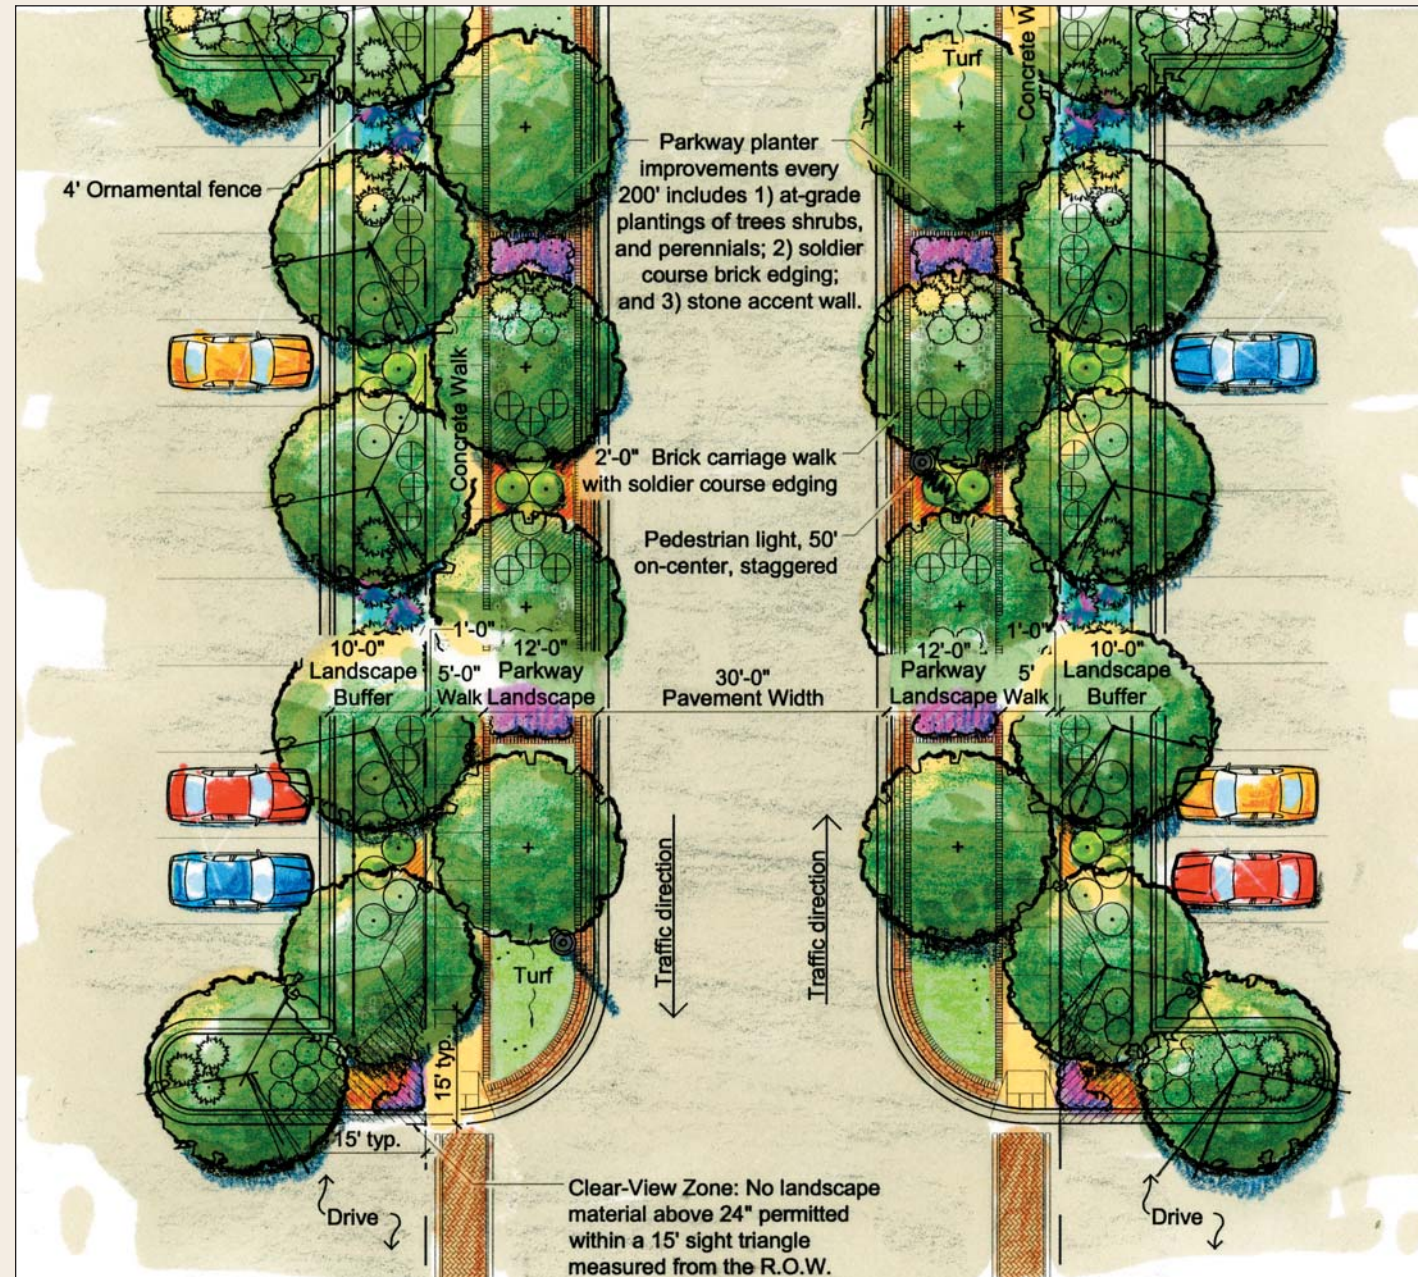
Streetscape Design Plan, Type I illustrates streetscape materials and their locations. Type I streets have a pavement width of 30'-0".
